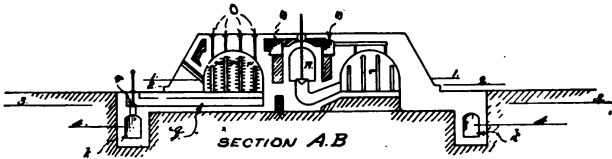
PRODUCER GAS-FIRED BRICK KILN.
